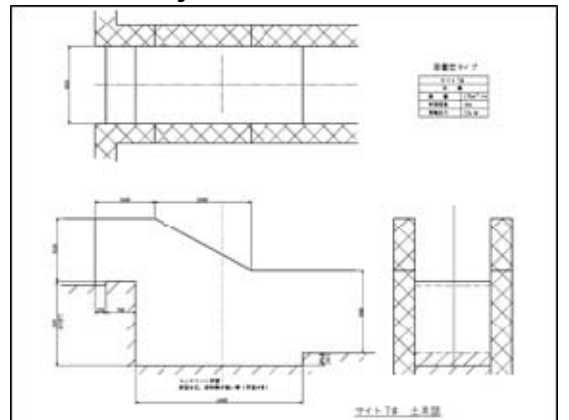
Installation of Power Archimedes - Hanging Type (No.3 Drop)
